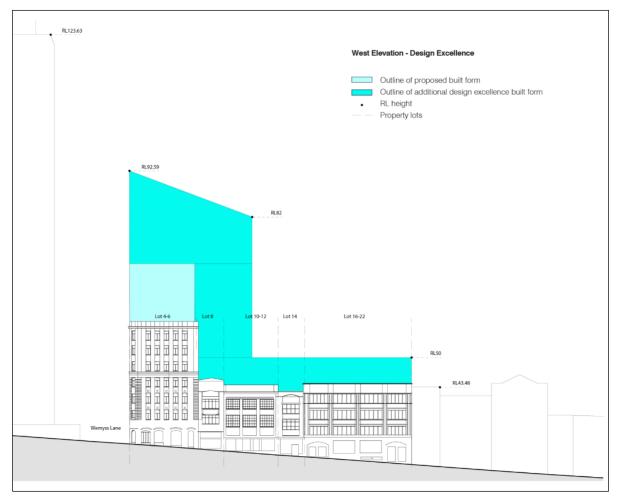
xxx: 4-22 Wentworth Avenue - Maximum street wall heights
